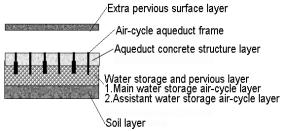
Section of JW Structural Pervious Air-Circulated Aqueduct Concrete Pavement.
